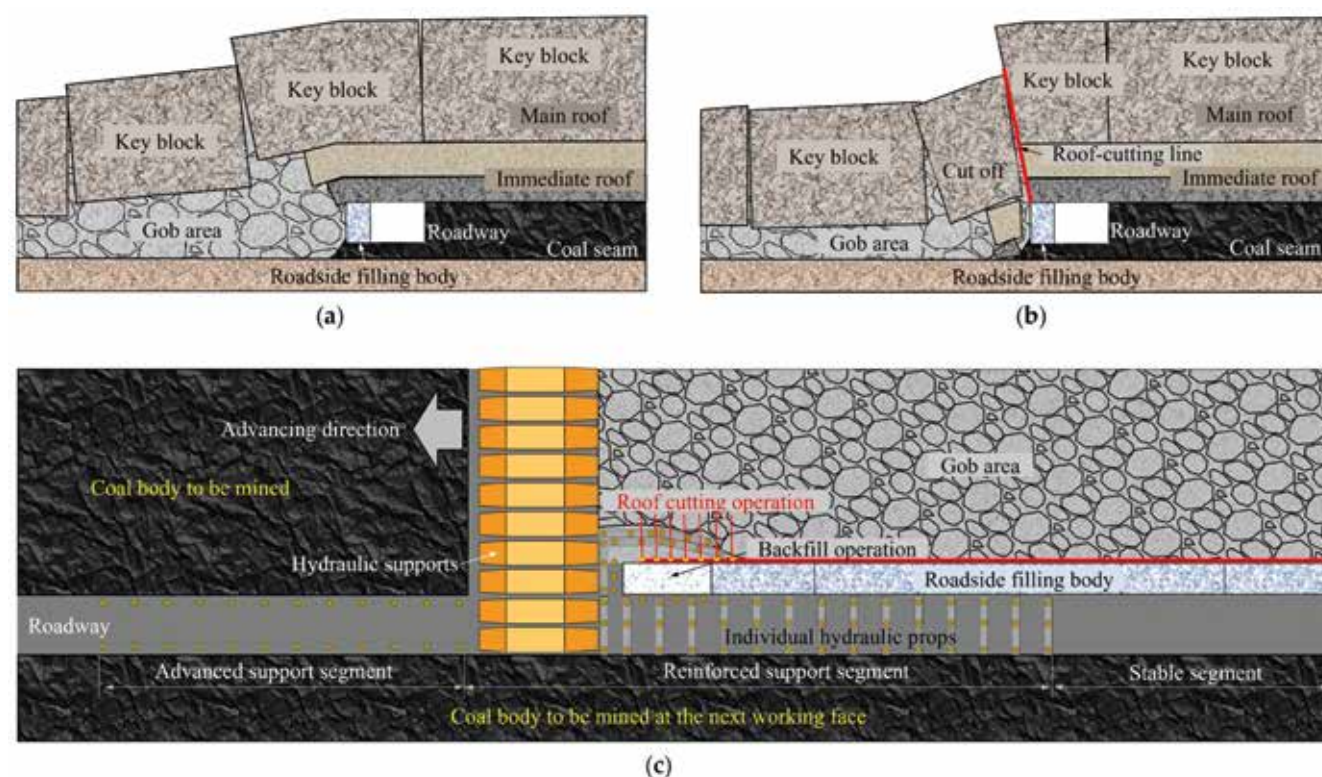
Advance pre-splitting and cutting roof for gob-side entry retaining. (a) Gob-side entry retaining with backfill (b) Roof cutting operation in advance (c) Working methods of roof cutting in advance and gob-side entry retaining with backfill.
